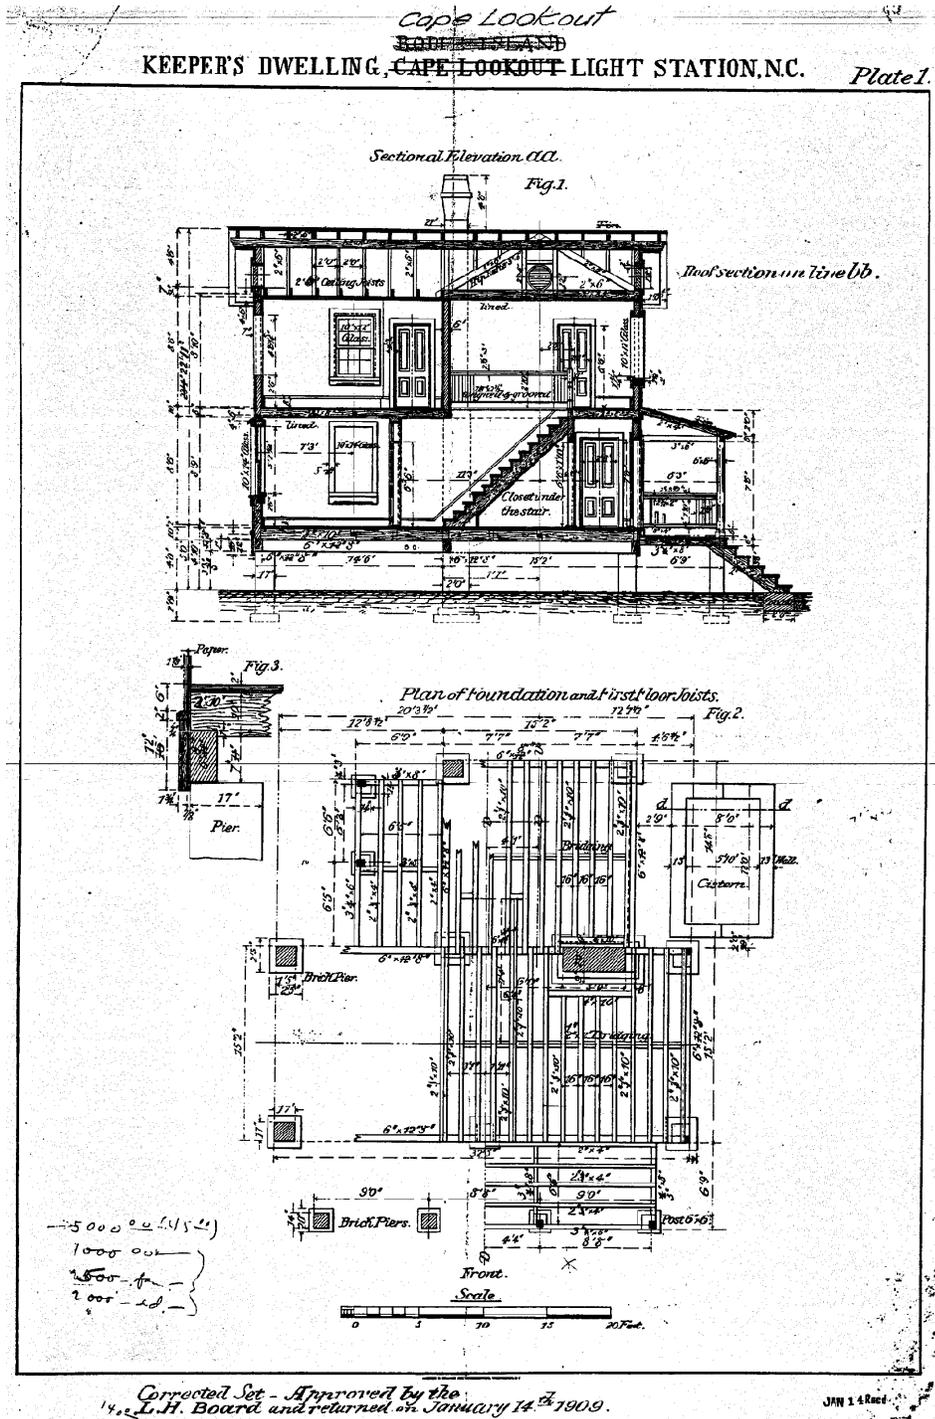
Original "as-built" section and framing. (U. S. Coast Guard, 1909)
